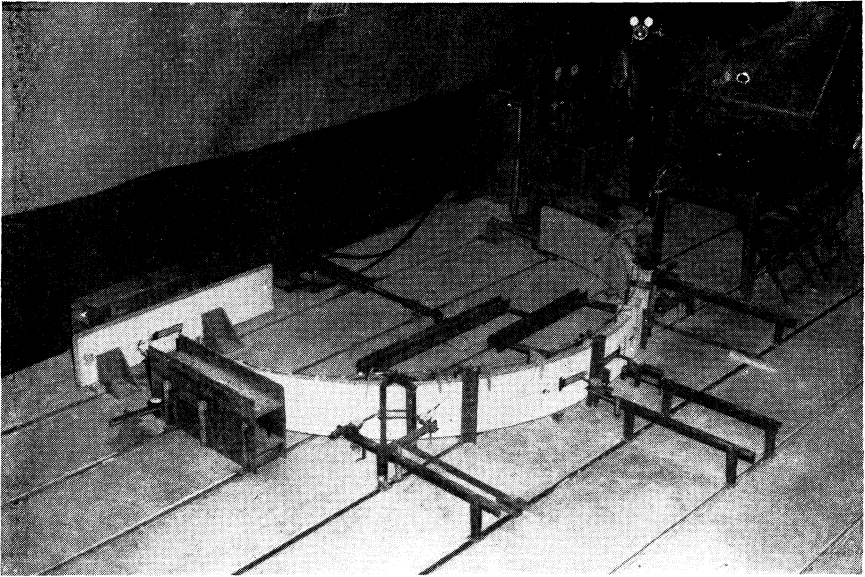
Model concrete shell arches installed for laboratory load-testing experiments.
